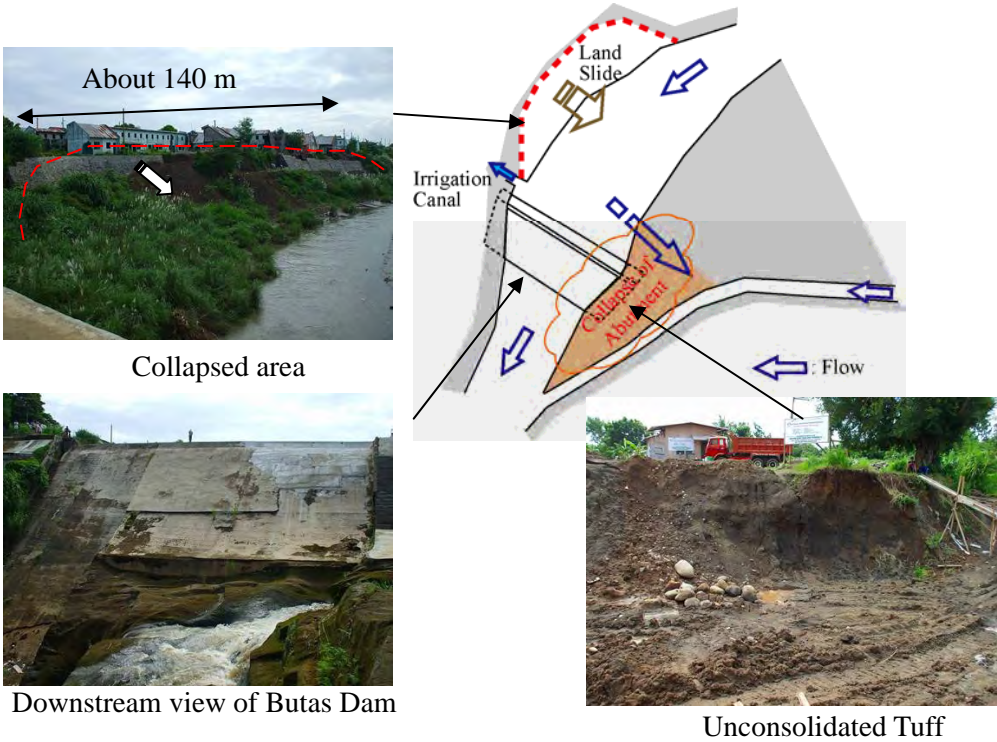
Butas Dam Site Condition (Source: JICA Study Team)
